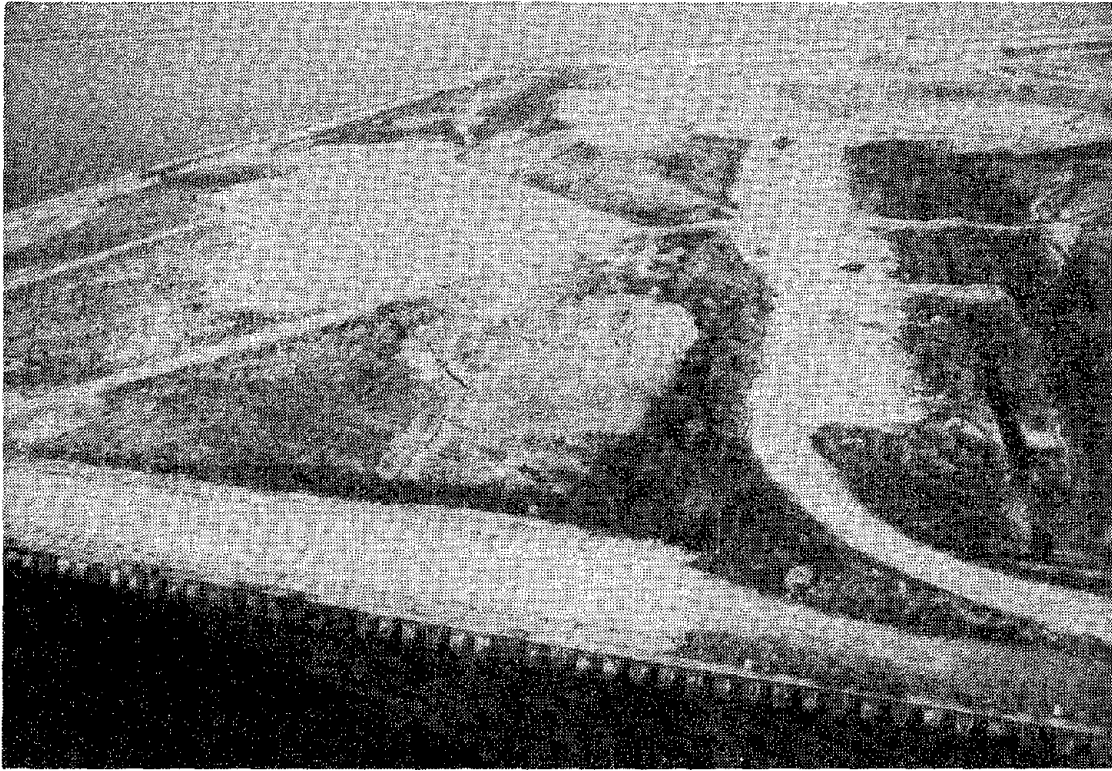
Aerial view of ground cracking at a waste fill site west of Osaka.
